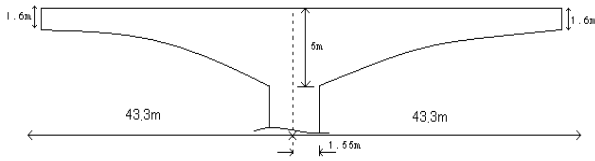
Typical Balanced Cantilever Segment in Burri Bridge
